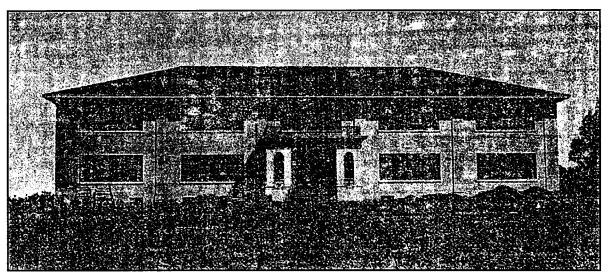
The main campus building of the Pā'ia Elementary School, under construction in 1926 (*Maui News* 12-4-26 3:1).
